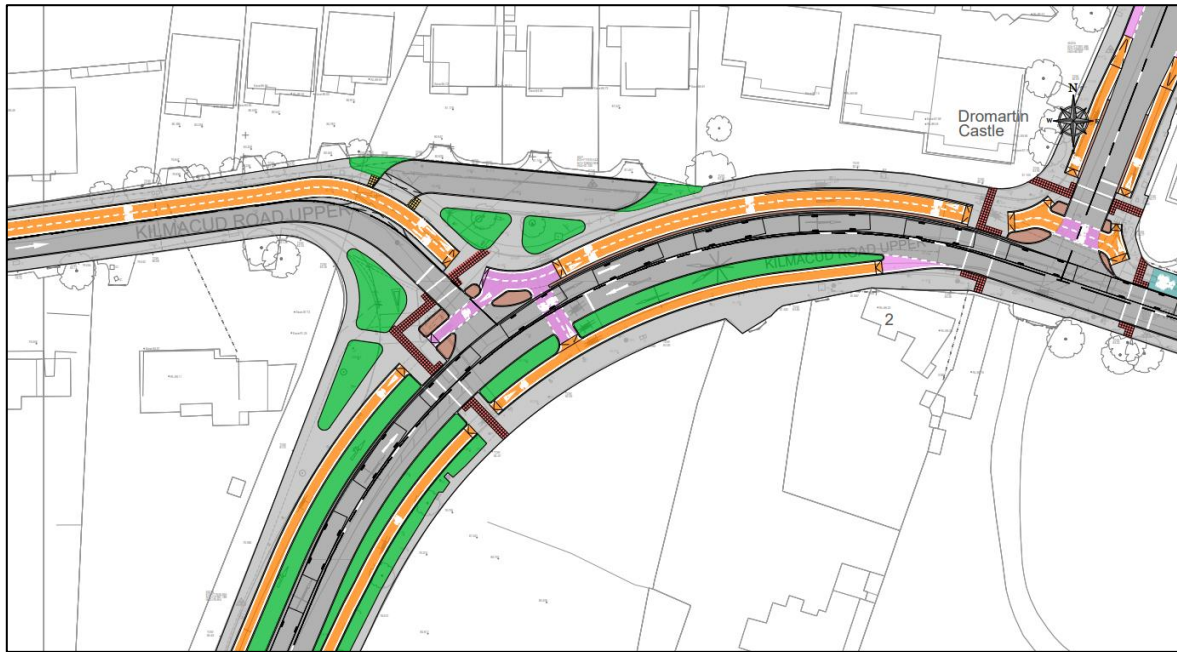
Kilmacud Road Upper / Overend Avenue / Birches Lane DS 2028 Layout
